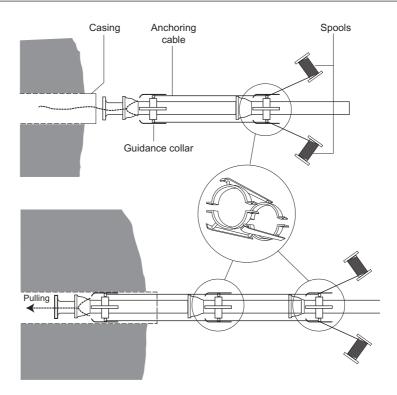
Pipe casing (Pont-a-Mousson, 1992).
